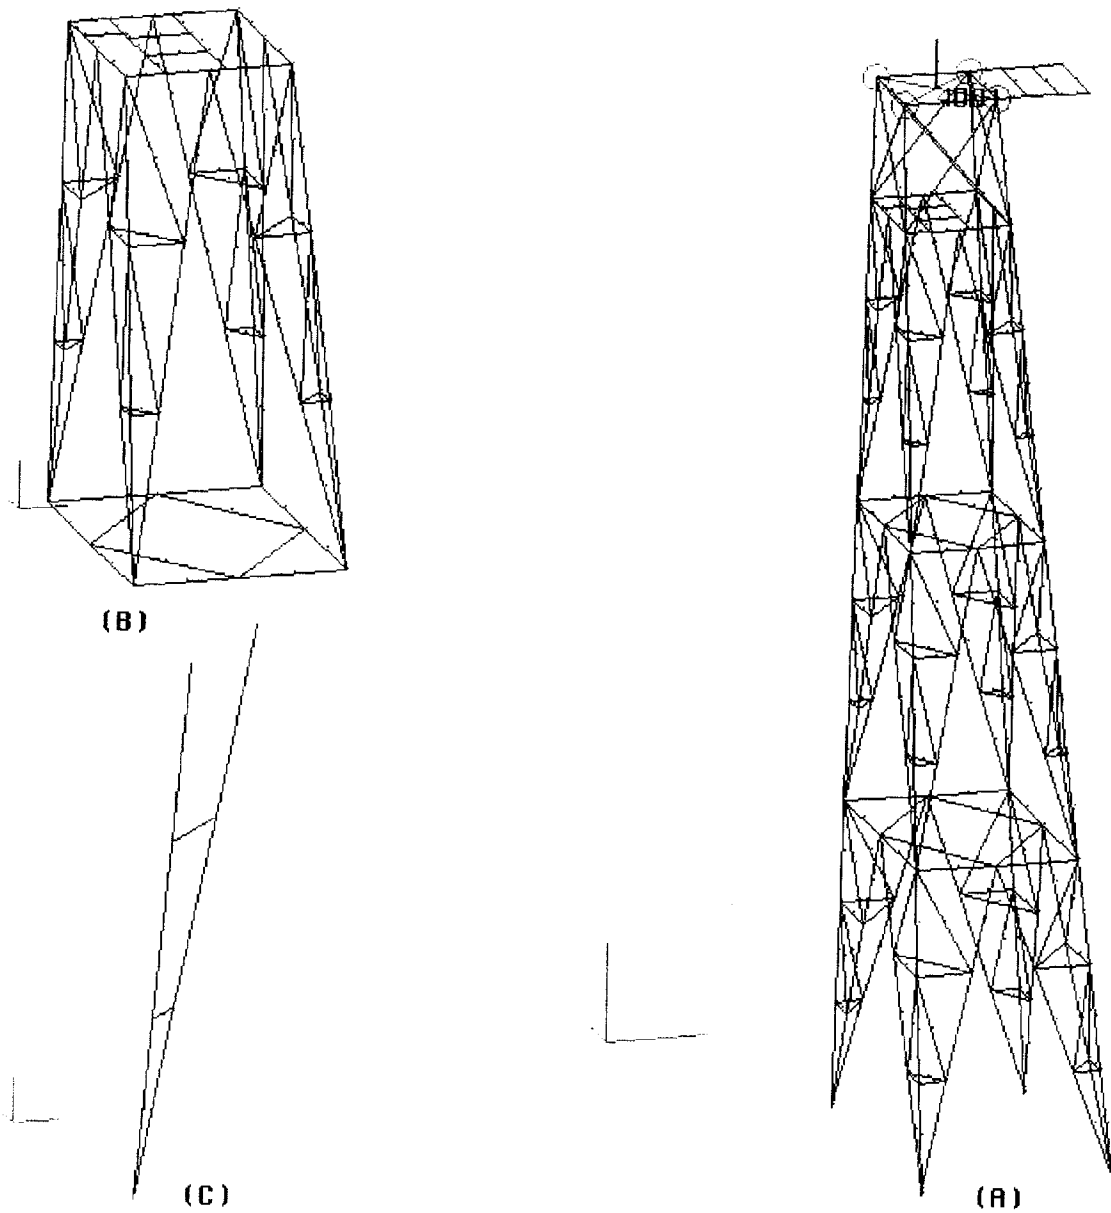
(a) 85' free standing tower. (b) Tower section between elevations 50' to 75'. (c) Main corner bracing, taken from tower section between elevation 50' to 75'.
